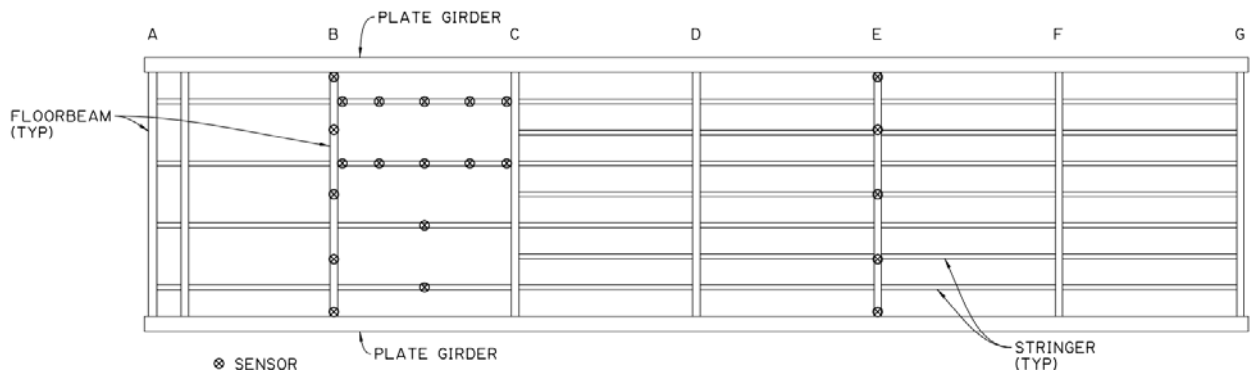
Location of Installed Gages for Steel Plate Girder Swing Span
